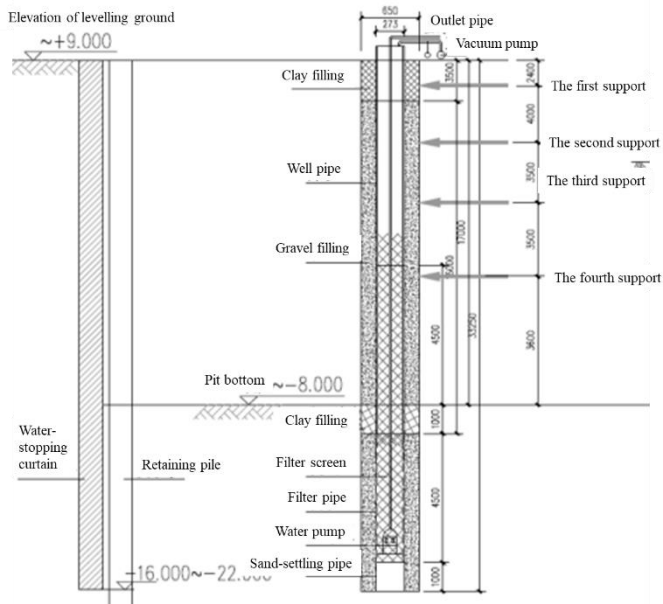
Schematic Diagram of Elevation Layout for Foundation Pits
